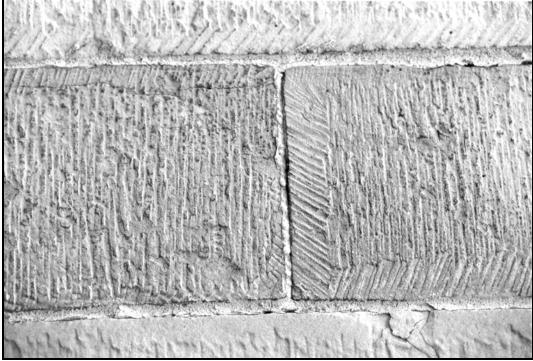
Details of the dressing used on the stonework on the south elevation of the original house. This dressing is finer that used on other elevations and was meant to create a formal façade (FRR June 2001).
